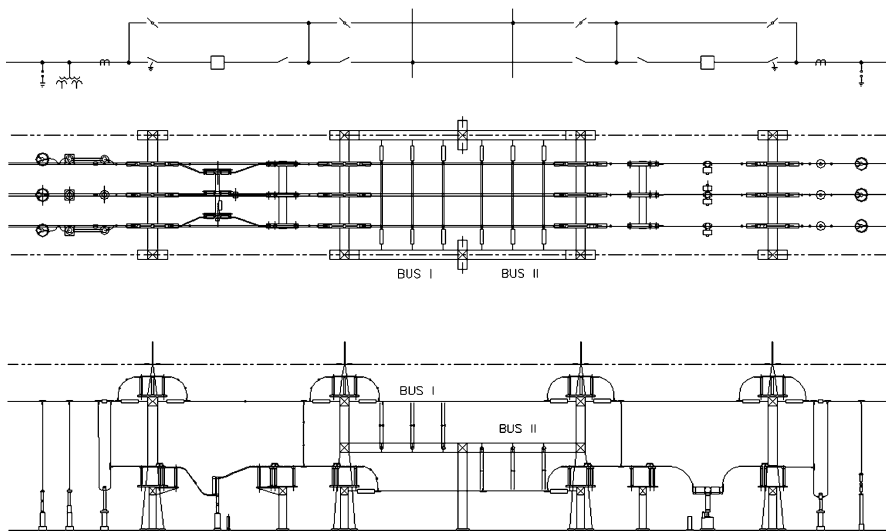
Double busbar with five disconnectors (plan view and elevation)
